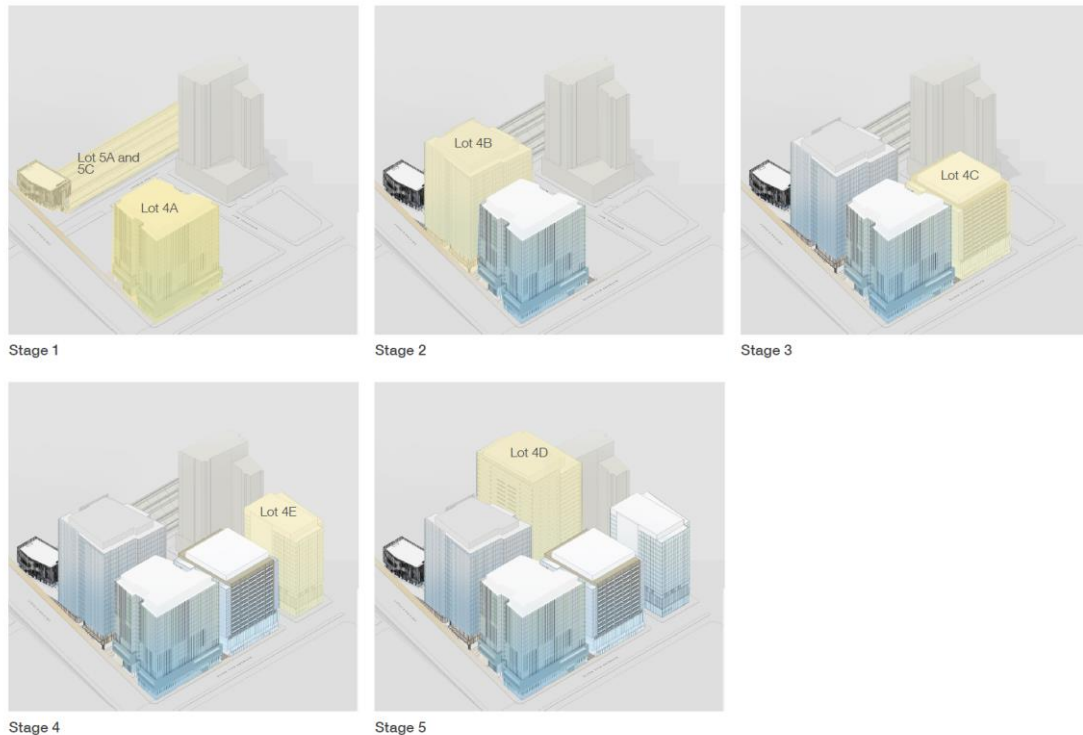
Extract from 'Development Plan Collins Square – April 2011' staging plan, with Goods Shed South shown in Stage 1
